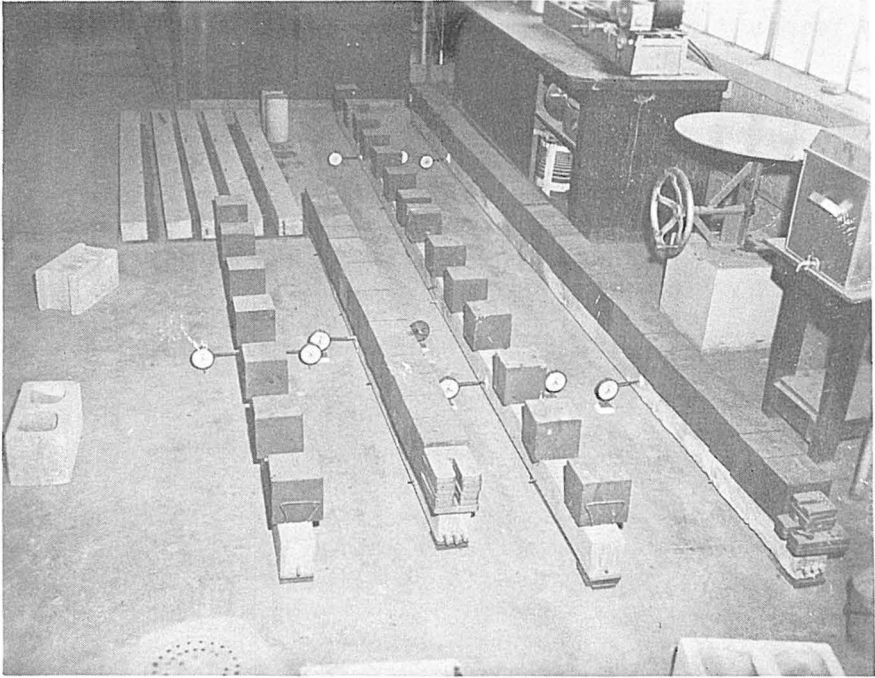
View of test beams, shrinkage specimens and instrumentation
